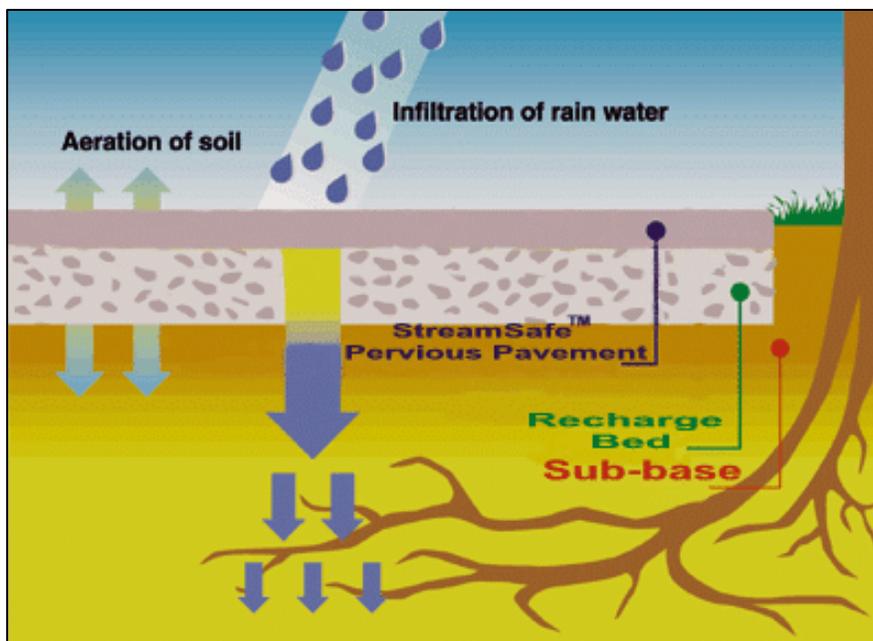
Demonstrates how water moves through permeable pavement to recharge area and reaches vegetation roots reducing the need for irrigation. (Source: WI Concrete Pavement Association).
